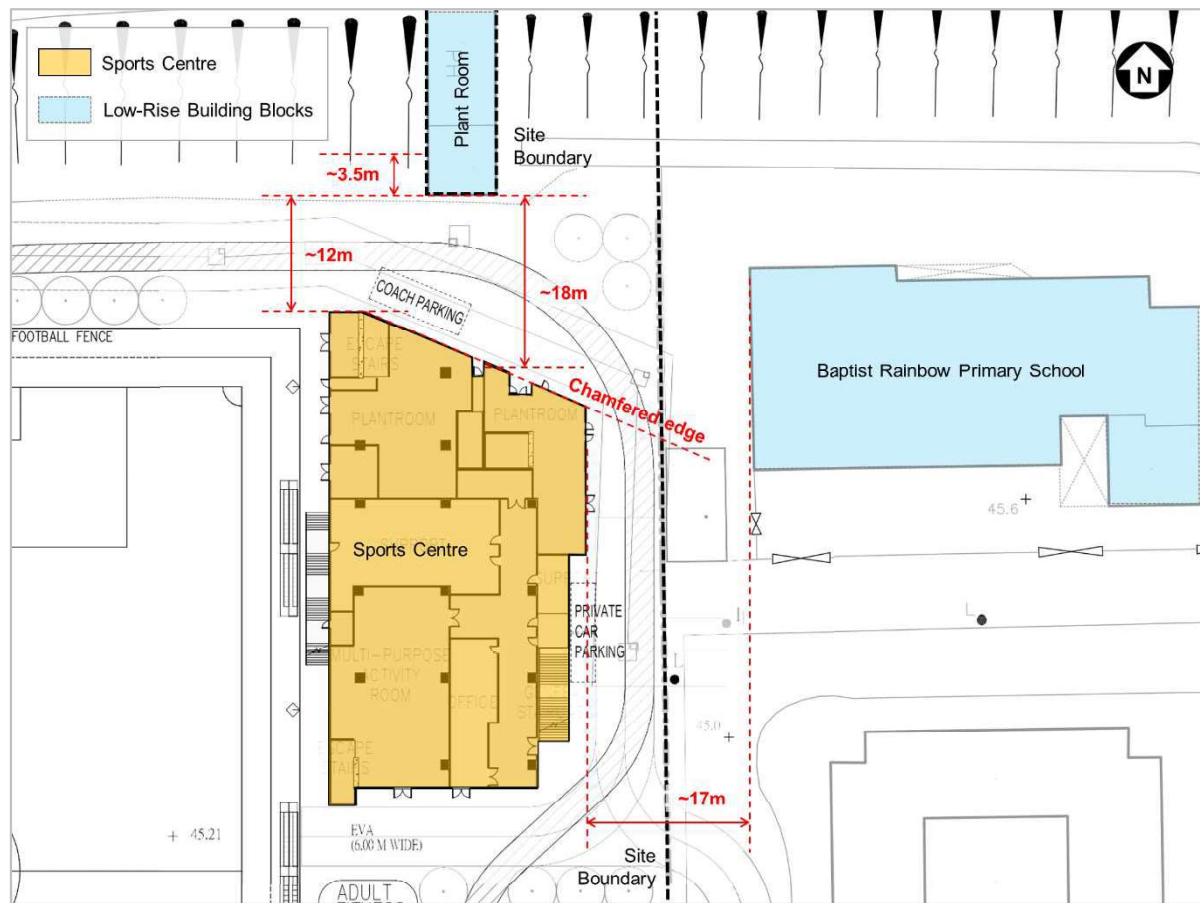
Layout Plan for Sports Centre at Ground Floor Level
